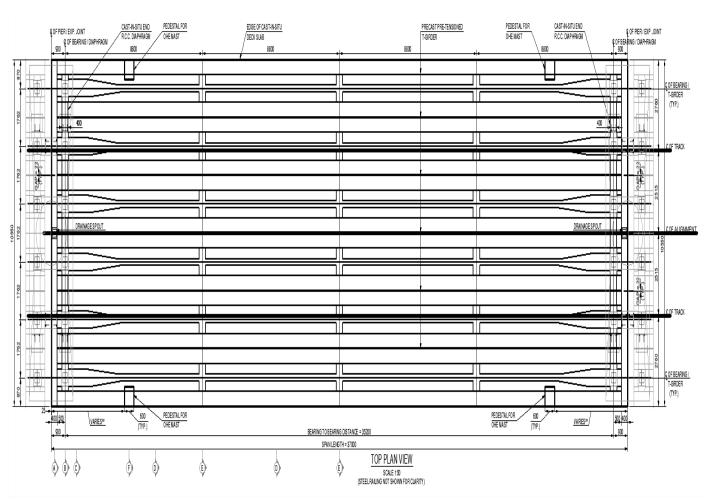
Plan view of 37m Span (6 – T Girder Straight Span)
